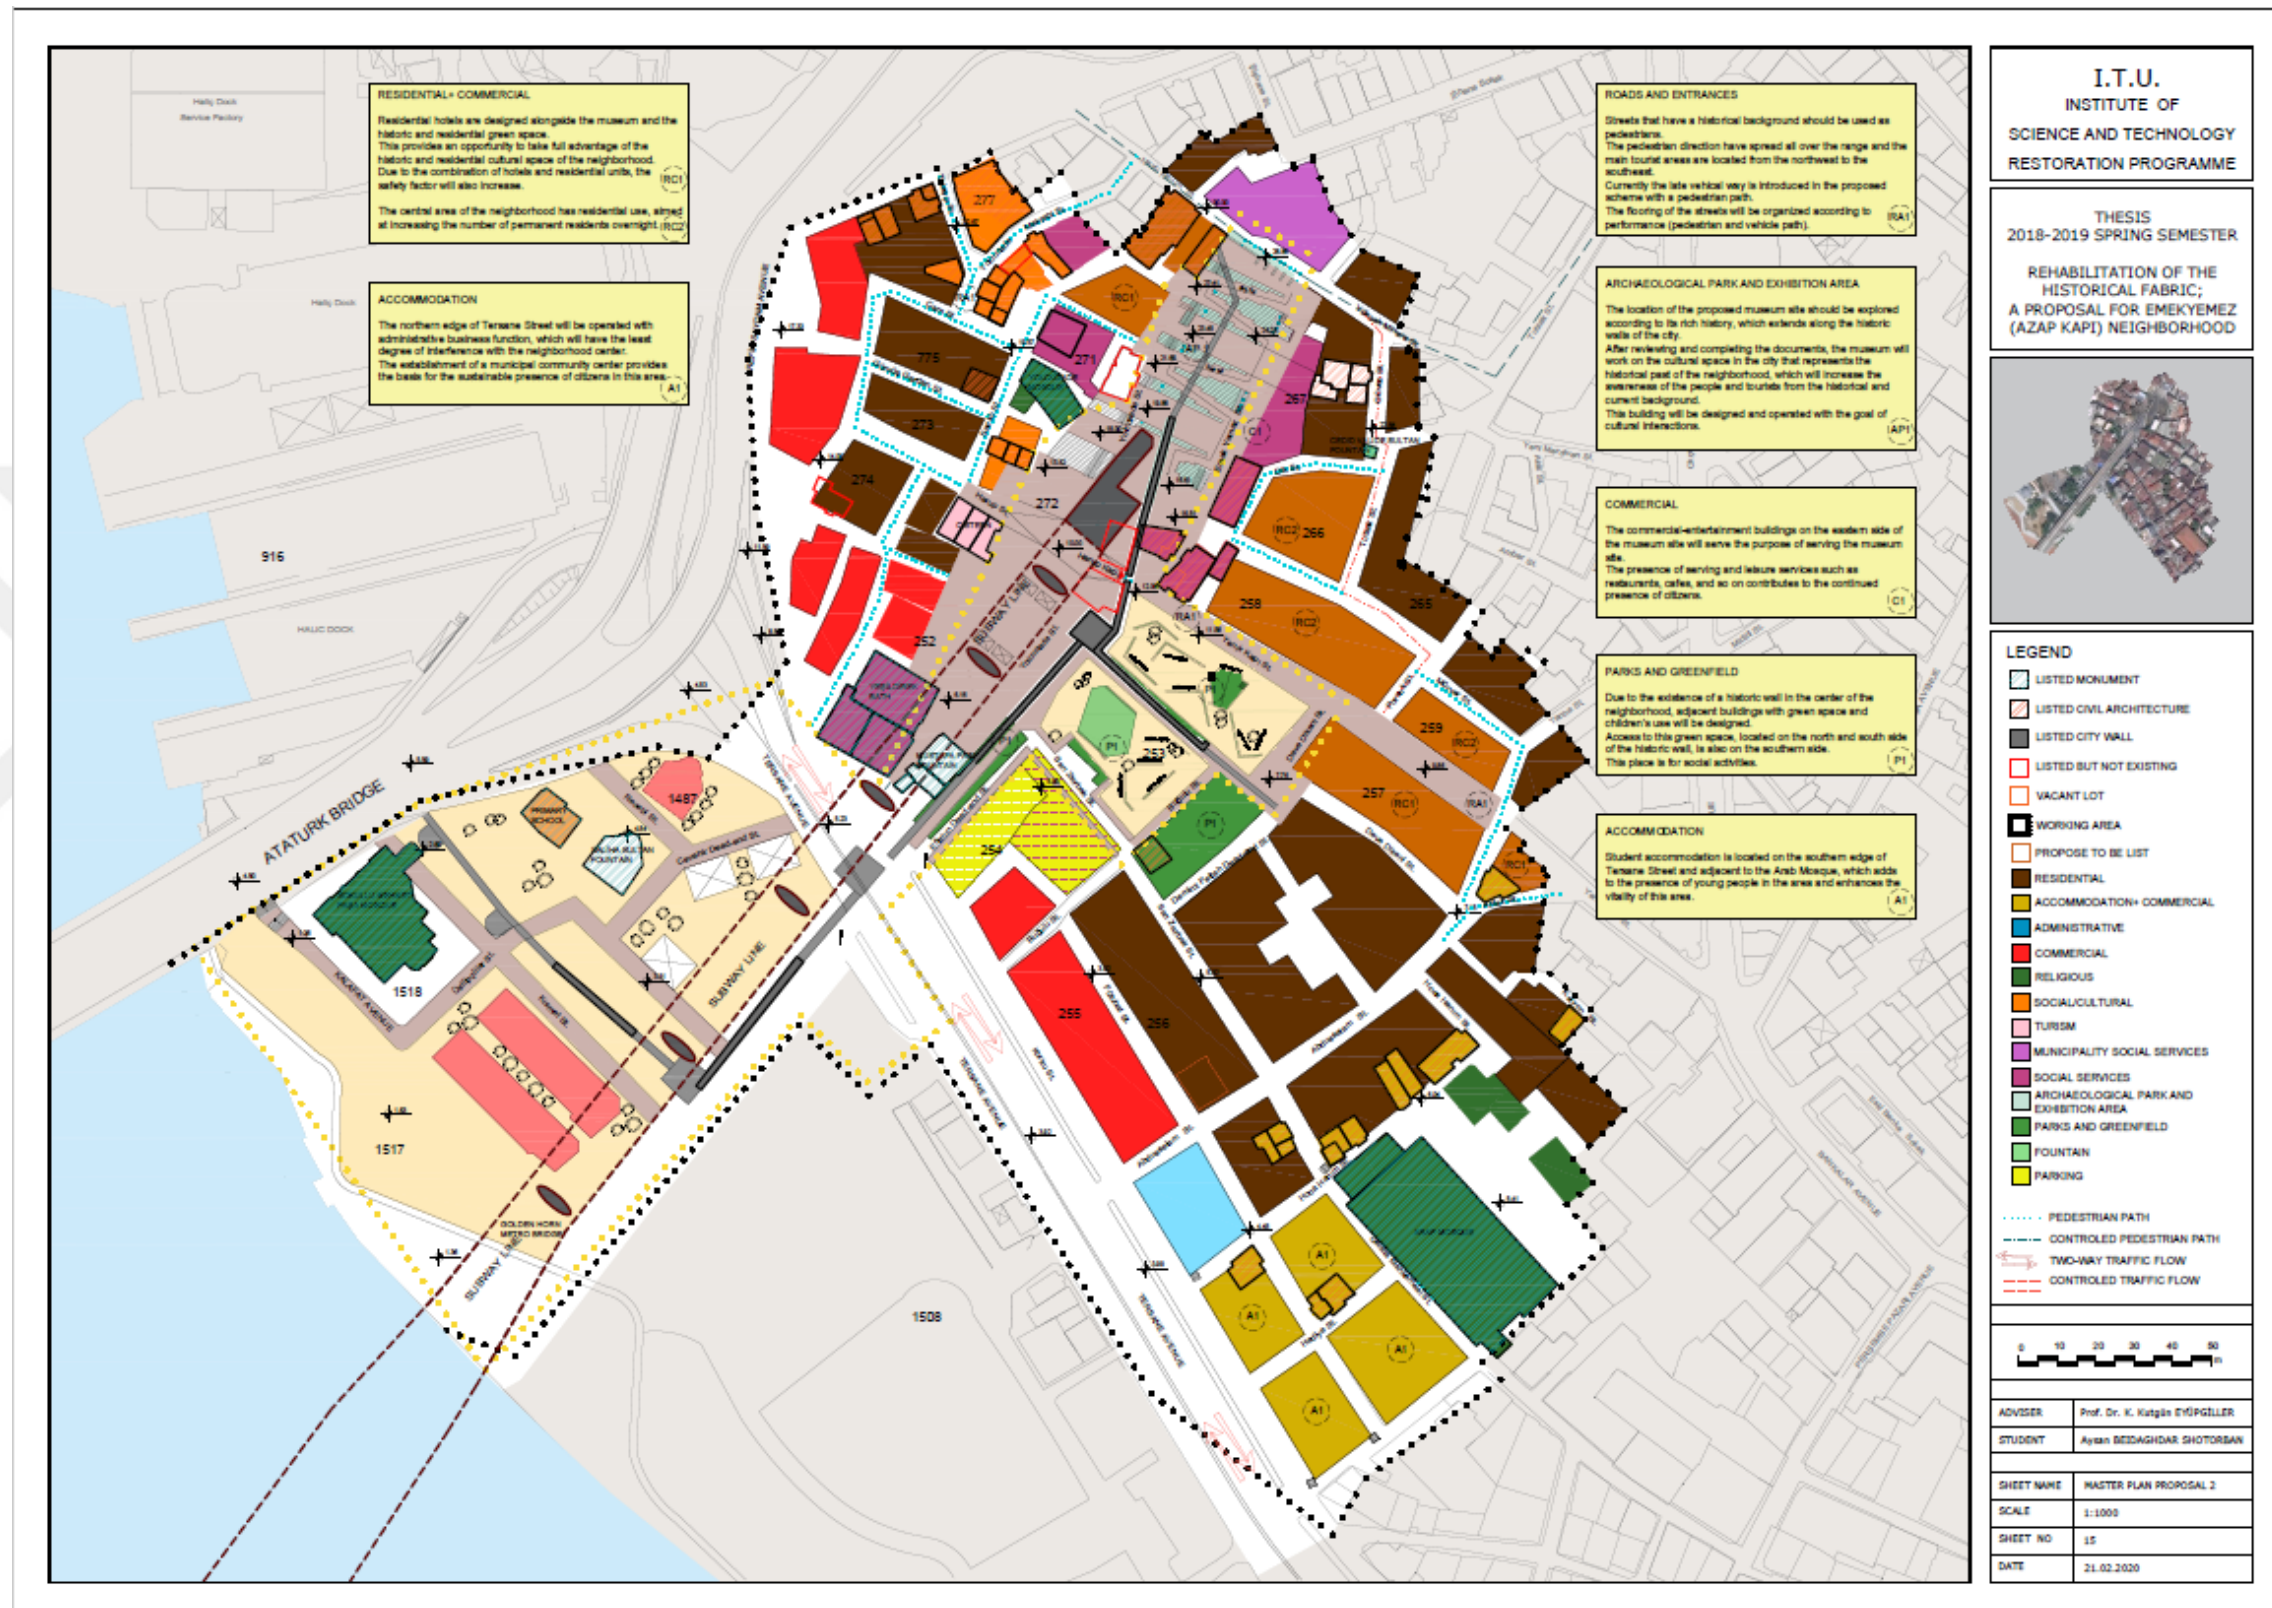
Emekyemez Neighborhood master plan 1/1000 scale.
